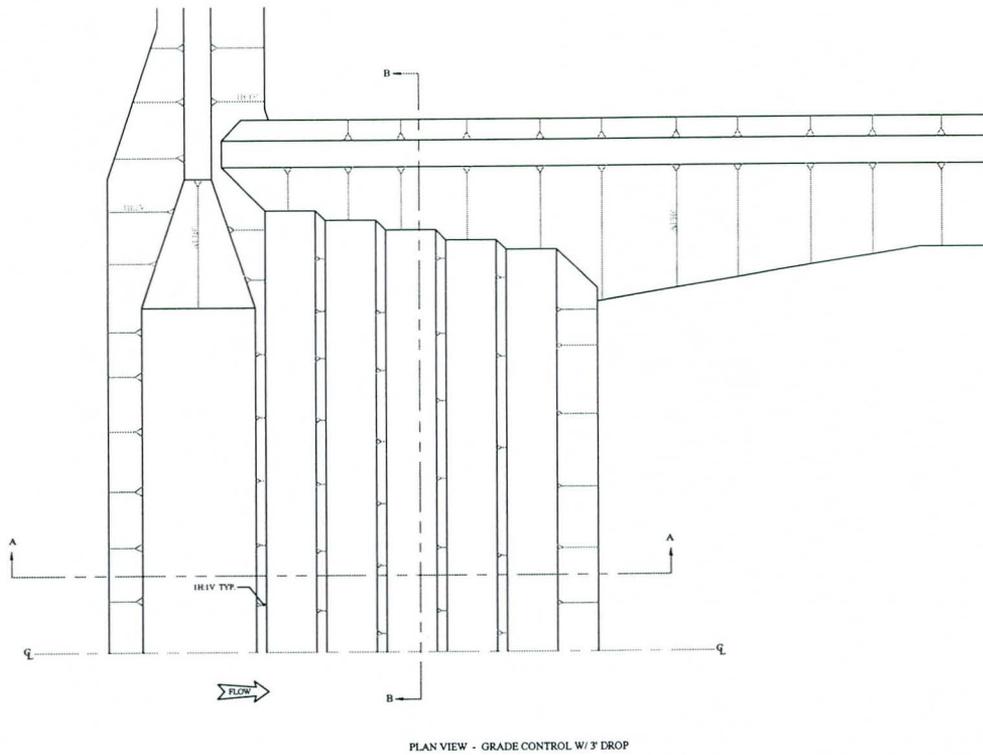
Typical plan view of grade control with 3 foot drop. Centerline of channel is at bottom of figure.
